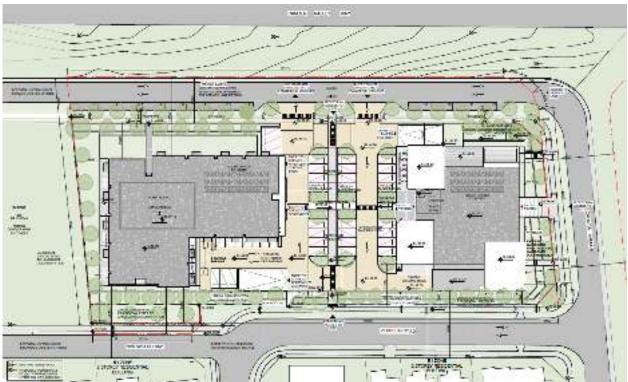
Proposed Site Plan. (Source: Marchese Partners, Ref: DA1.07, Rev E, dated 14/10/2020)
